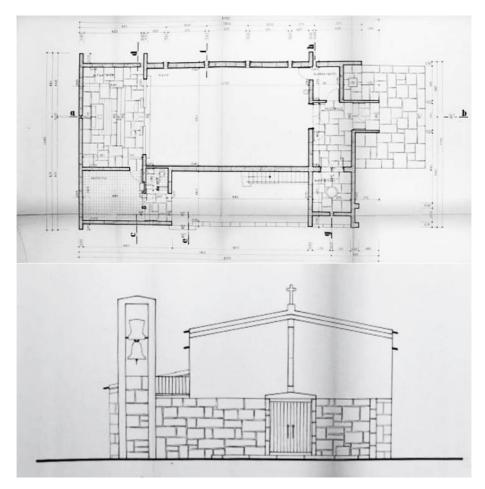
Elevation and plan of the Chapel. Project by architect António Trigo. Boalhosa Agricultural Colony. *Junta de Colonização Interna, 1960
